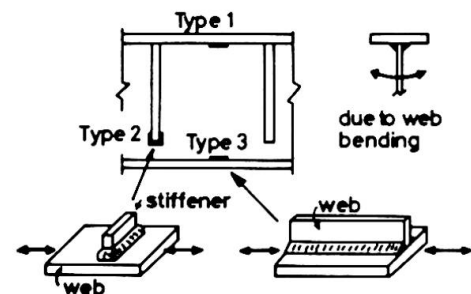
Typical Patterns of Fatigue Cracks
